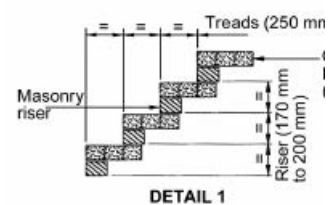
Stair detail (SANS Part M, 2011:9)
